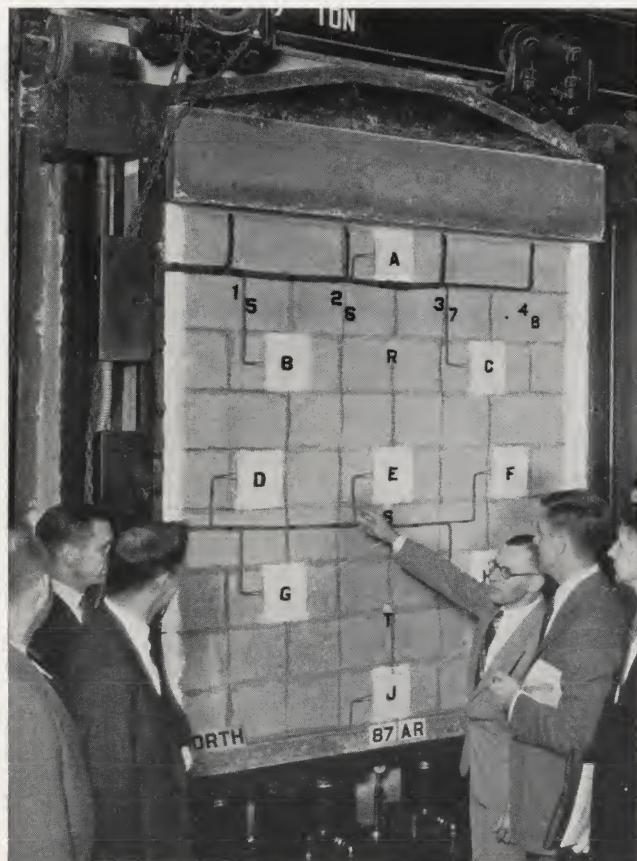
Concrete masonry wall in position for fire testing at Portland Cement Association Laboratory.
